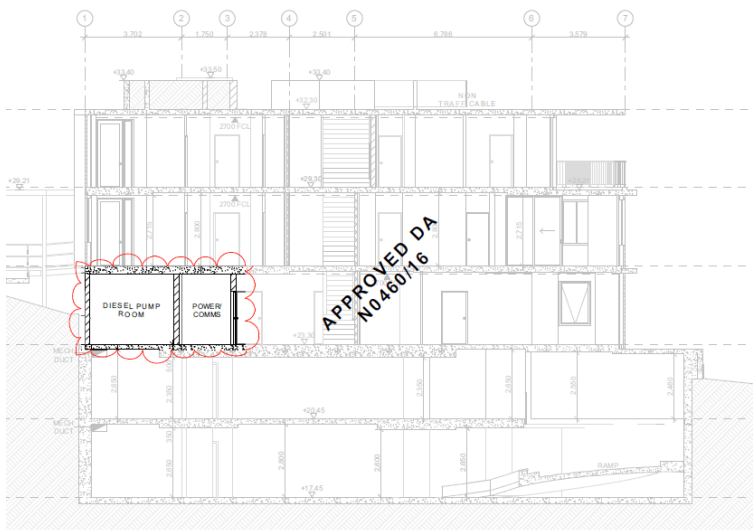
Addition of diesel pump room and MDB (Extract from Architectural Plan Section CC, A 04.001)
